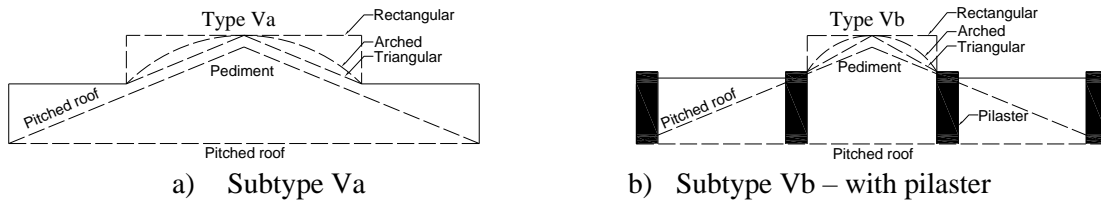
Type V - Solid parapet with pitched roof having central raised portion.
